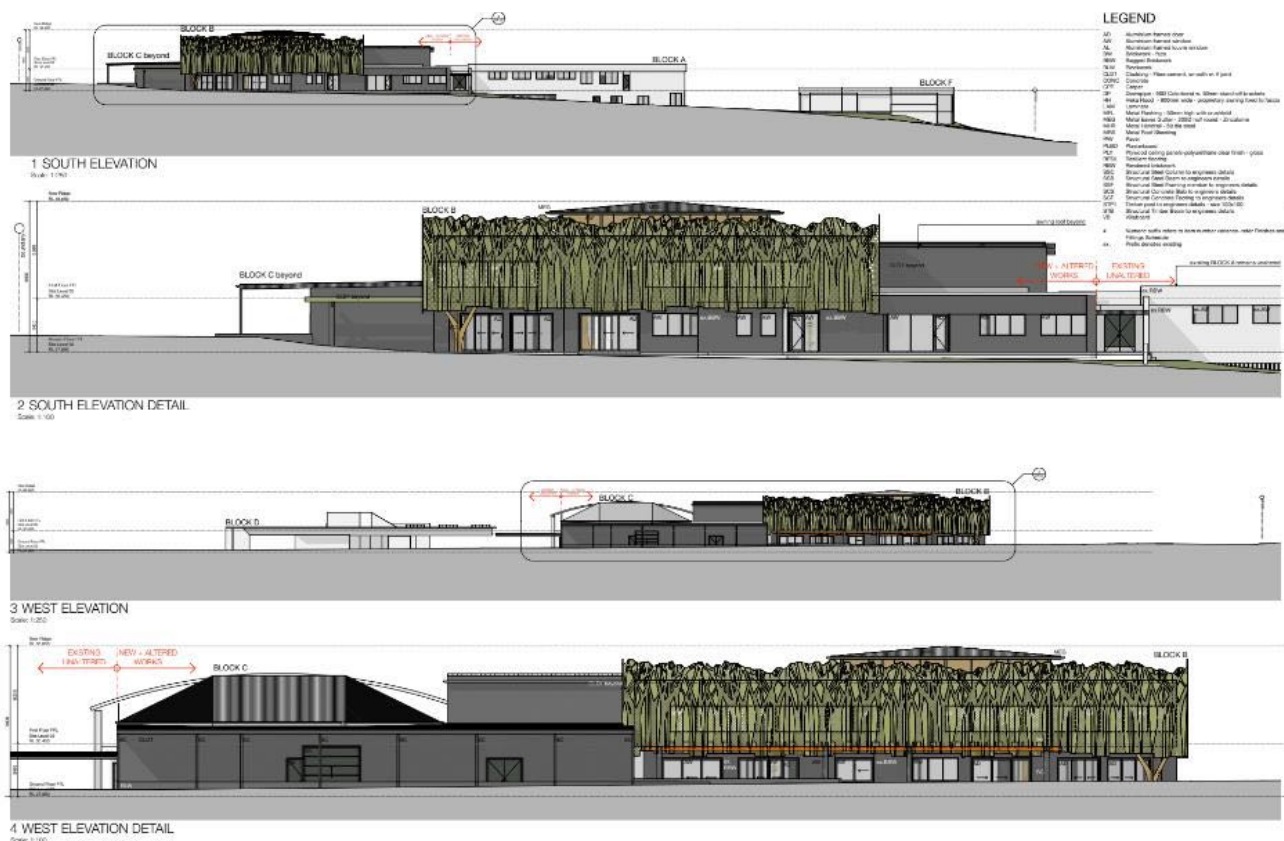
Extract of Elevation Plan prepared by *Austin McFarland Architects*.
